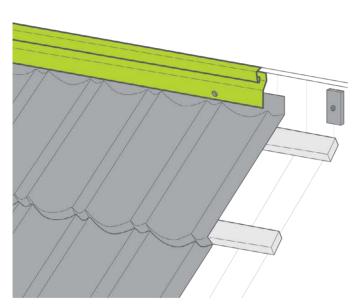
FIXING HORIZONTAL FLASHINGS (ALTERNATIVE)
